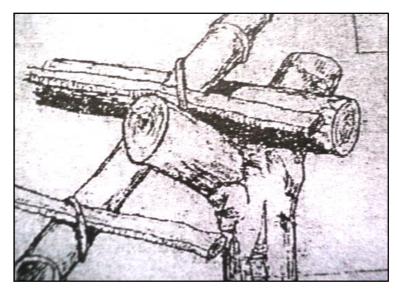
Timber Posts Used for Roof Construction. Source: Field Survey (2017).
